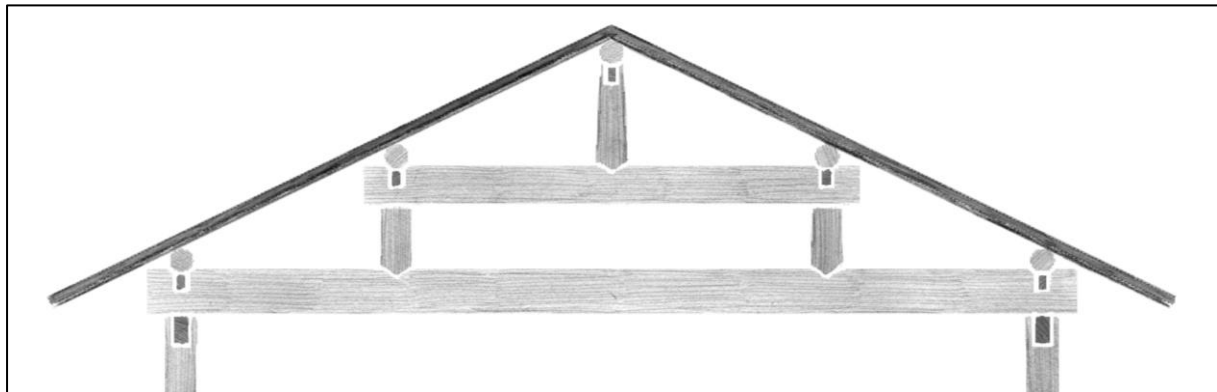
Classic Chinese post and beam roof structure with *Zhi* and *Mantou* joints. Similar roof designs can be found in dwellings and bridges alike. Drawing adapted by Eva Kévers-Leclercq based on [87].
